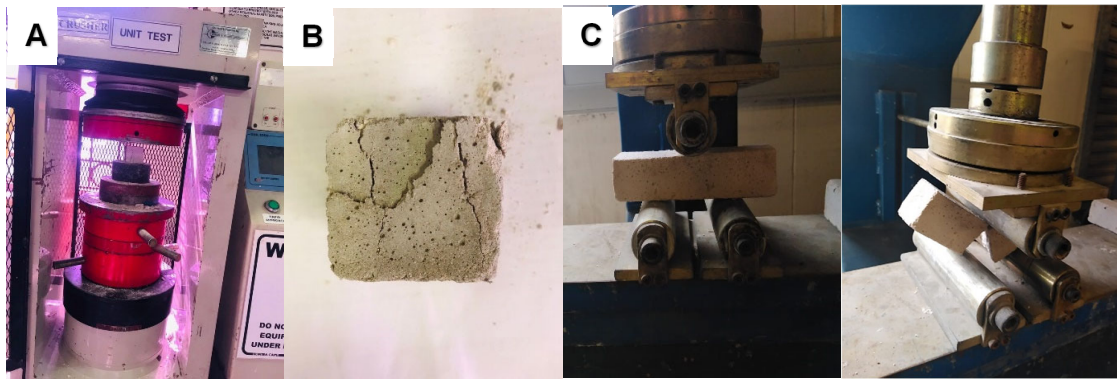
A) Mortar cube testing equipment B) Cube failure pattern C) Prism centre point loading and D) Prism flexural failure
